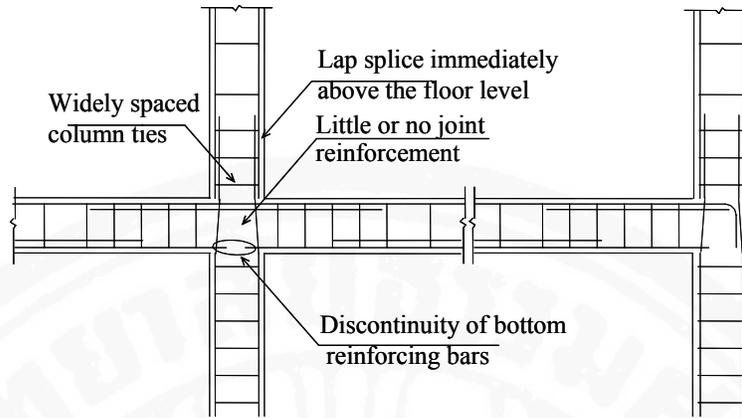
Typical non-seismic reinforcing detail of RC frame designed for gravity load only
